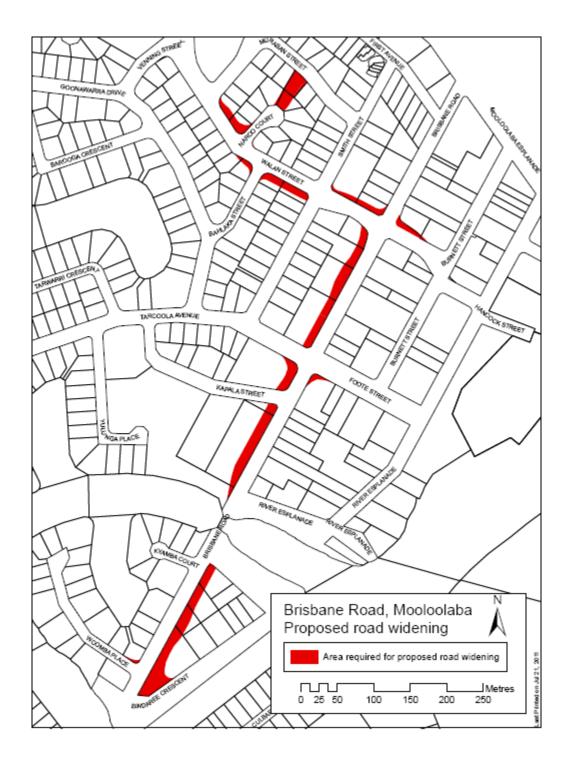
A (Mooloolaba/Alexandra Headland Local Plan Elements)
